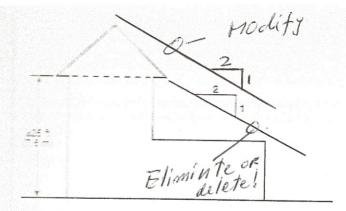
(b) Lower Roof Protection Provided by Pitched-Roof Buildings 25 ft (7.6 m) or Less in Height.
